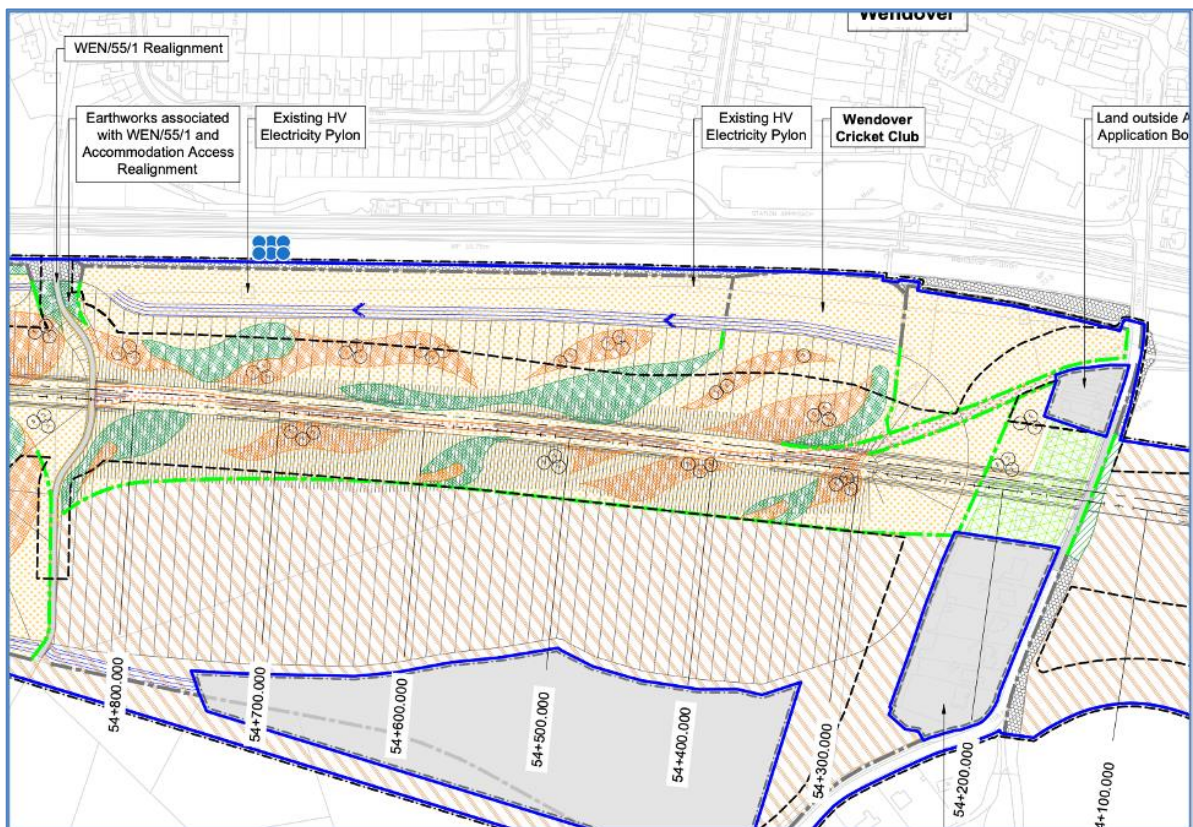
; Extract from the “Landscape Planting Plan, sheet 2 of 2 - 2419788”
